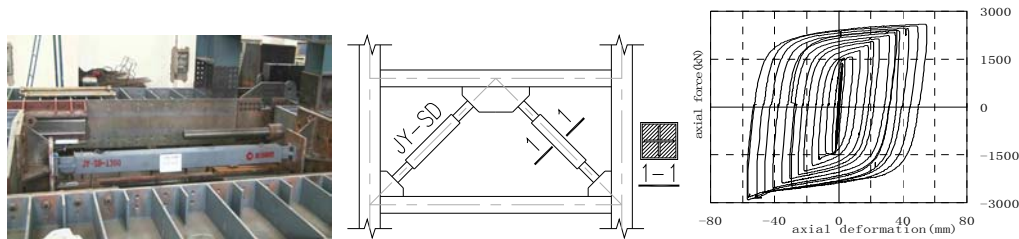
Unbonded brace member test, gable elevation layout and test hysteresis curve
